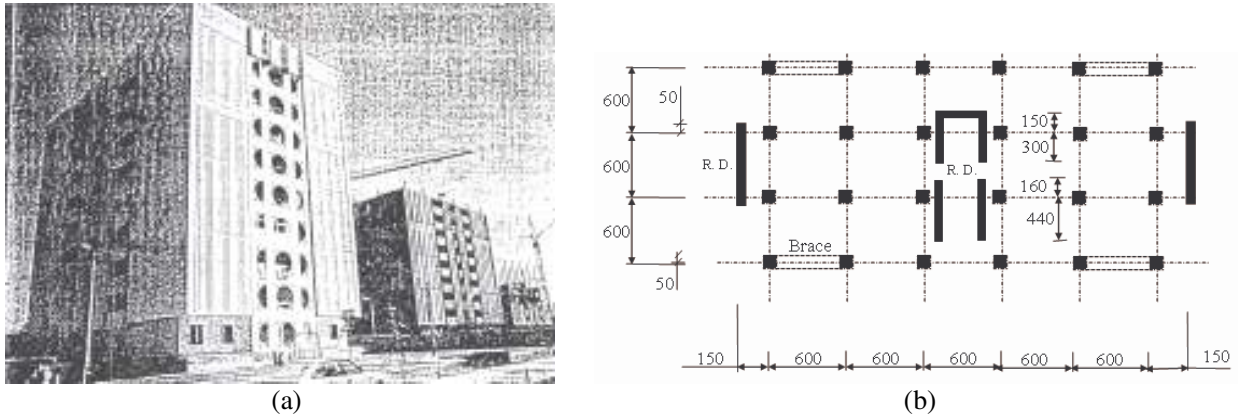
The 11-story building: (a) general view, (b) typical floor plan
